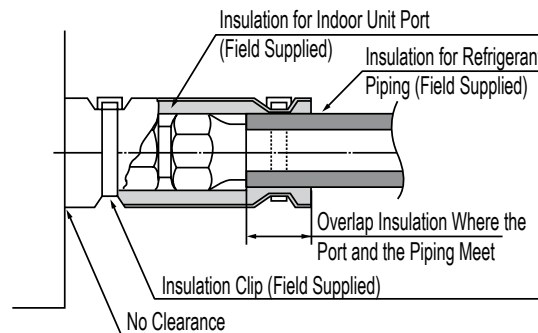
Typical Refrigerant Line Joint Insulation Detail
